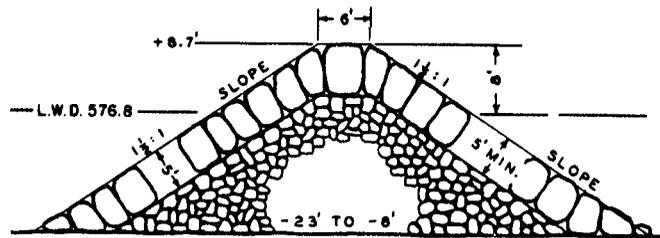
Typical breakwater cross sections, Port Washington Harbor, Wisconsin
